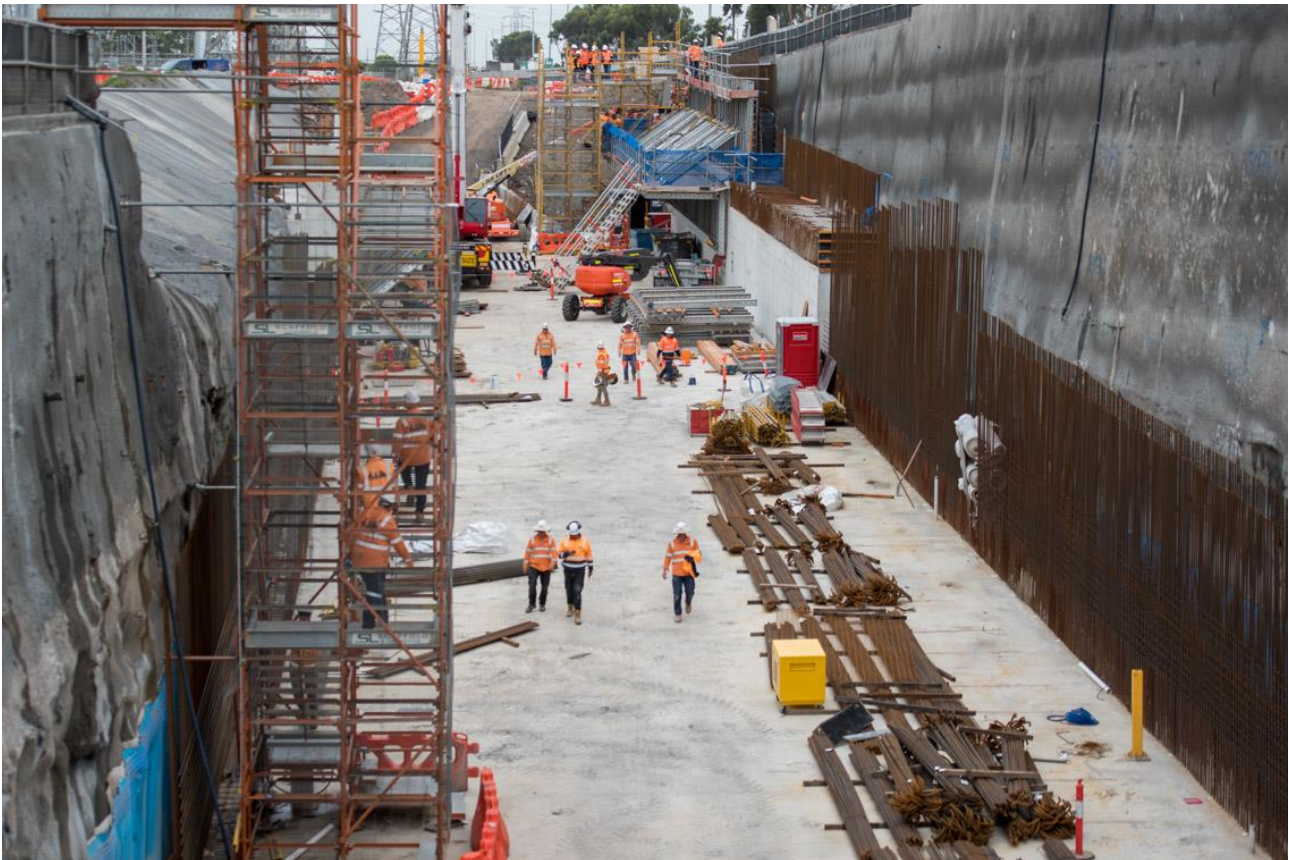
South Portal Outbound base slab works – Tunnel Zone (Source: WGTP MTIA, 27 February 2020)
